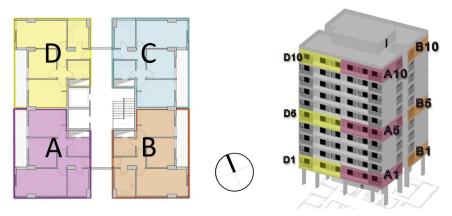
Apartments as thermal zones the tower building (T11) in the Peristeri urban setting.
